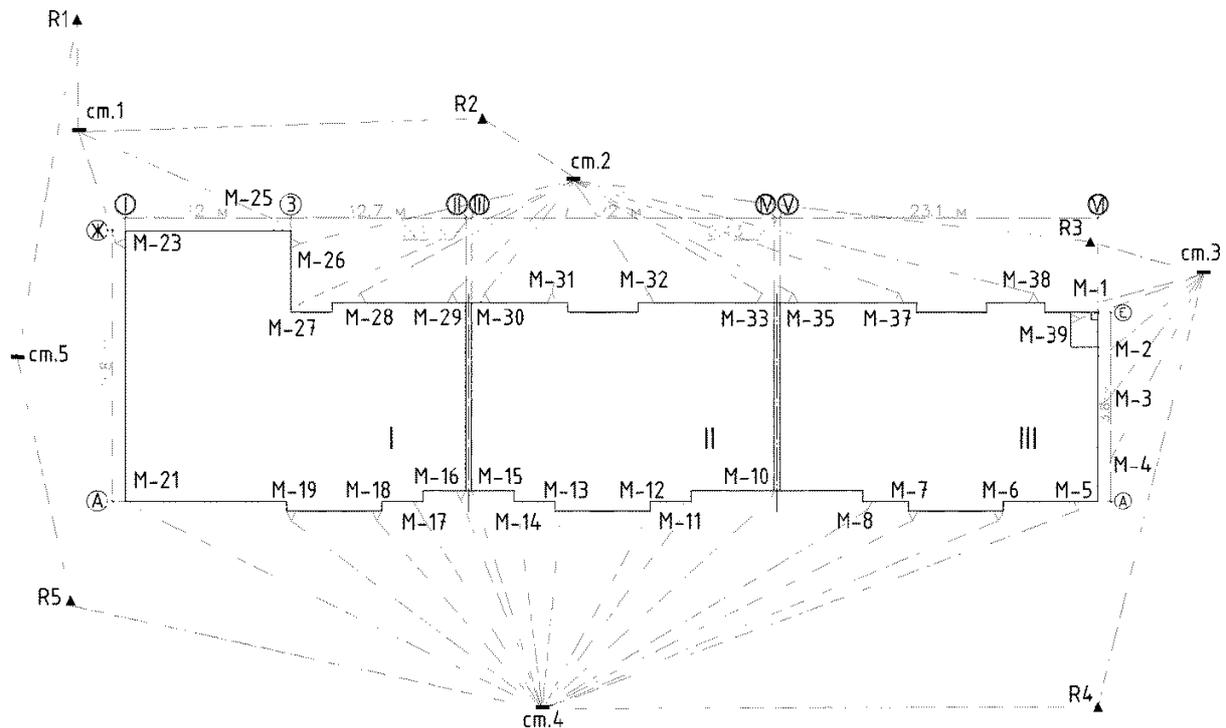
Scheme of the geodetic leveling marks of nine-ten storey house on (str. V. Kozak, 14 in Poltava) I-III – building sections; M-1...M39 – wall leveling marks; R-1...R-5 – bench marks; st. 1... st. 5 – leveling intermediate stations
